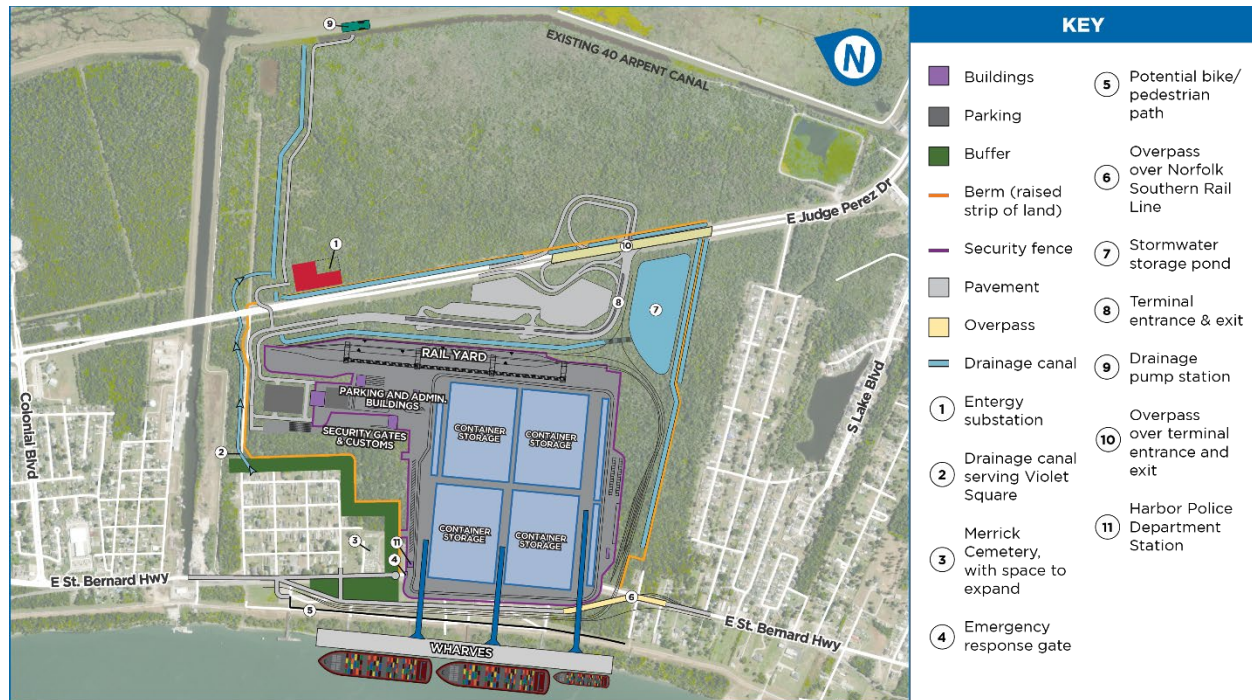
2024 GRR/SEIS Violet Site Plan – Proposed Layout of Louisiana International Terminal, St. Bernard Parish, Louisiana.
